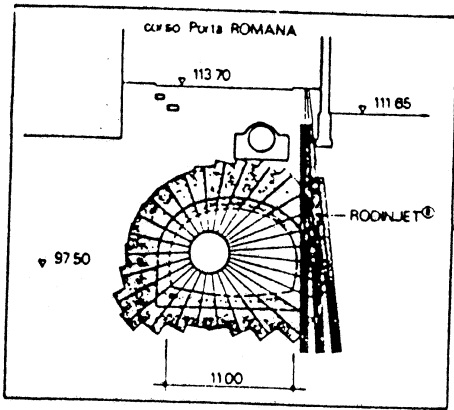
Radial Permeation Grouting From Pilot, and Jet Grouting From Surface to Protect Ancient Building, Milano Metro.
